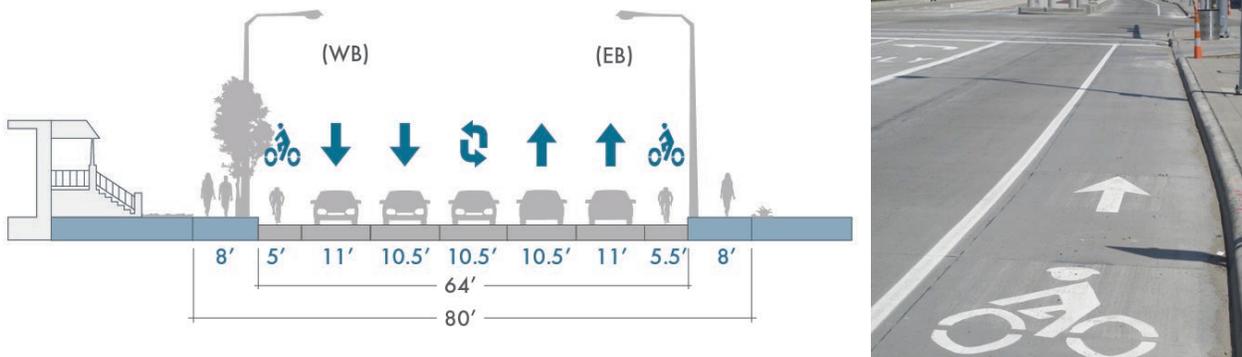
Proposed Street Section, Chapman Avenue: Placentia Avenue to Walnut Avenue, Bradford Avenue to Angelina Drive Key Map
